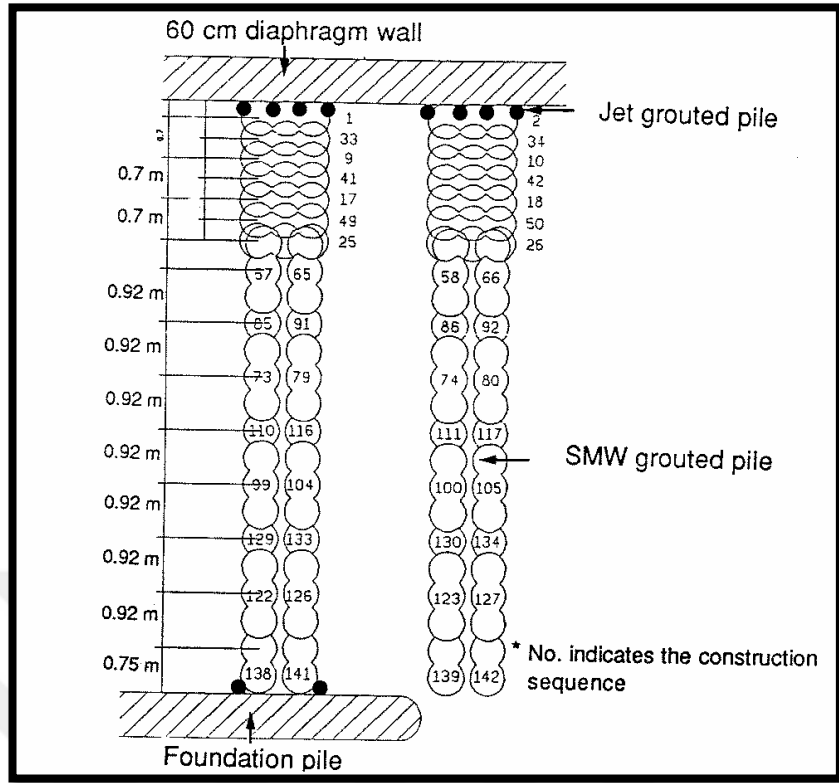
Plan view of base stabilization schemes (after Liao et al.,1992)
